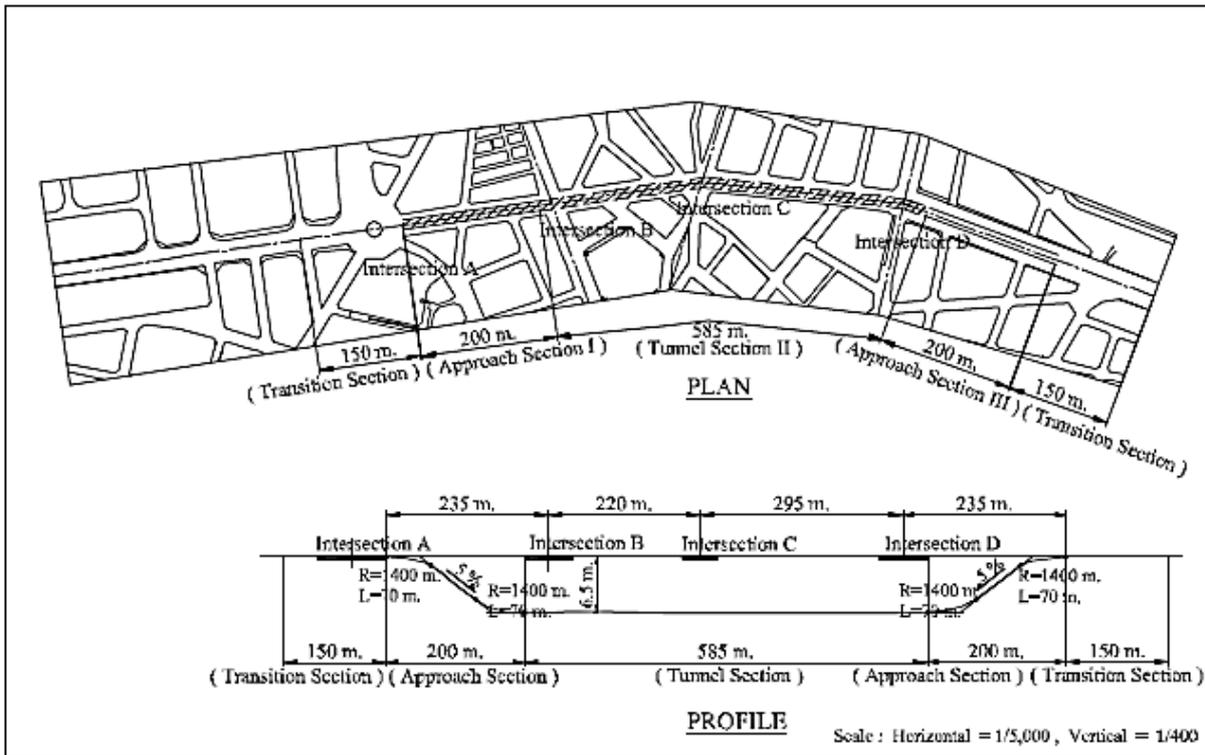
Tripoli Boulevard Underpass: Plan And Profile
